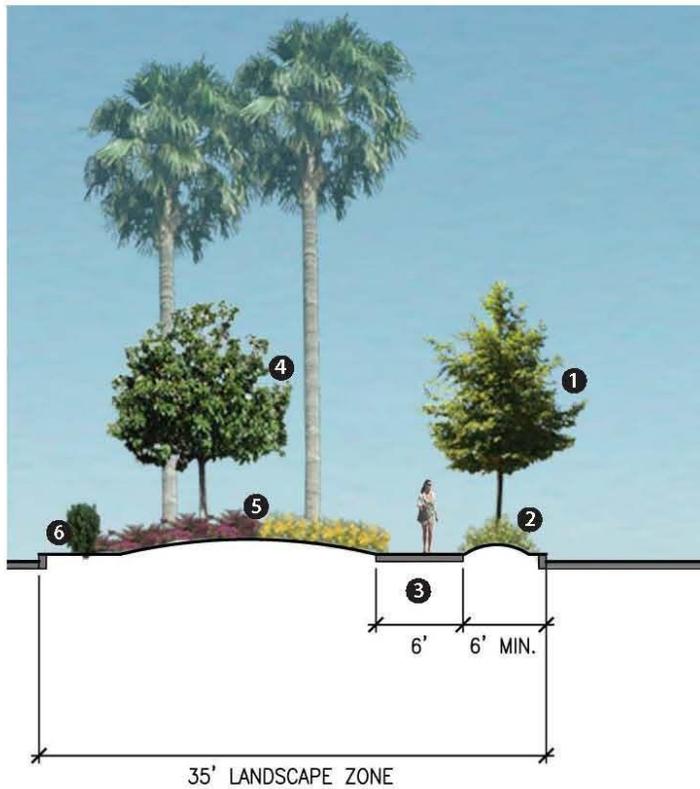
Murrieta Hot Springs Road Setback at Building Facade
